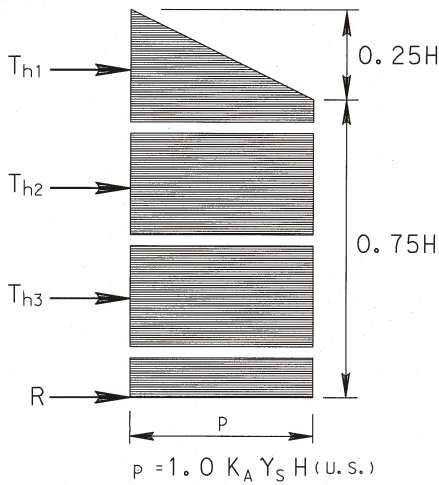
1 - Apparent Earth Pressure Distribution for Anchored Walls Constructed from the top down in Soft to Medium-Stiff Cohesive Soils
